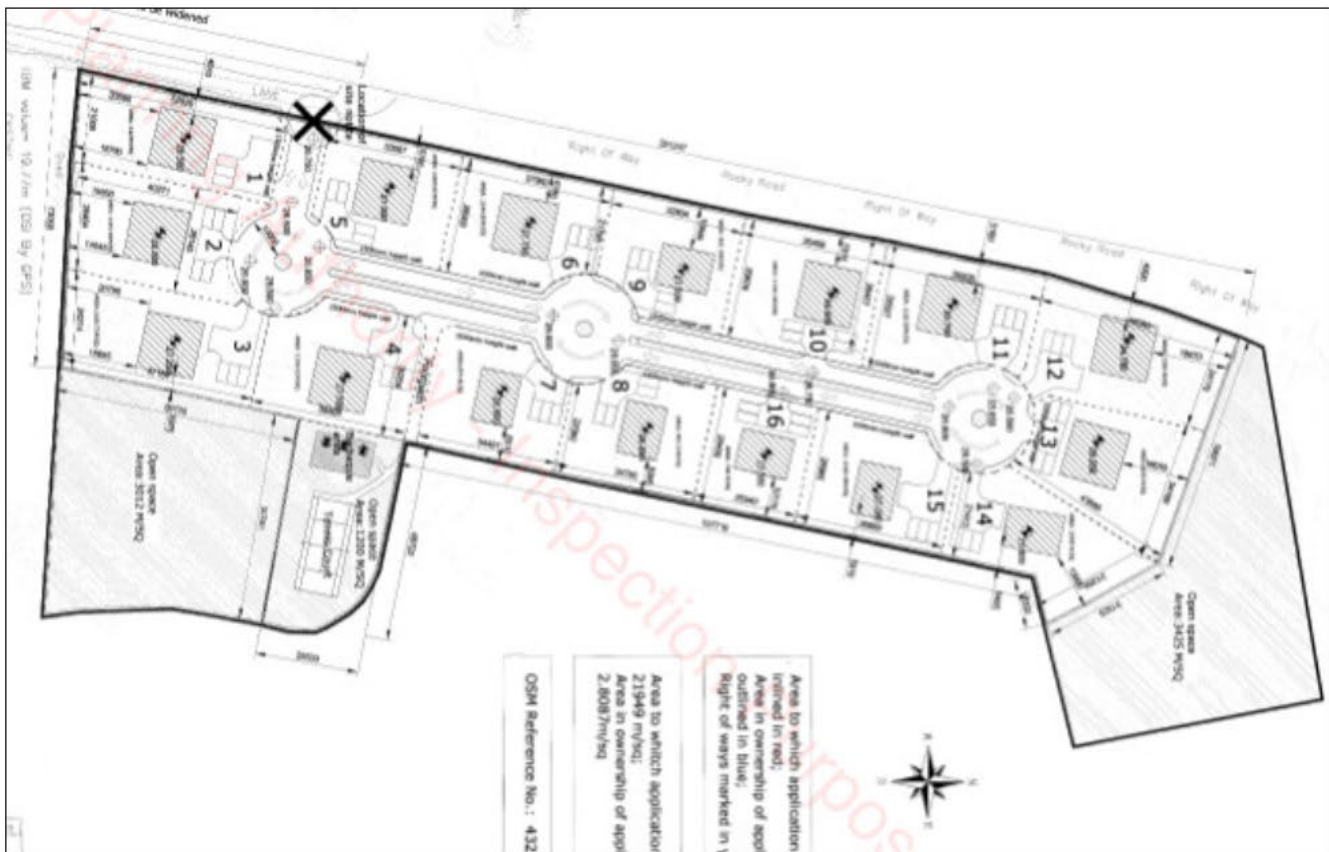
Site layout Plan refused under Reg. Ref. 08/730
